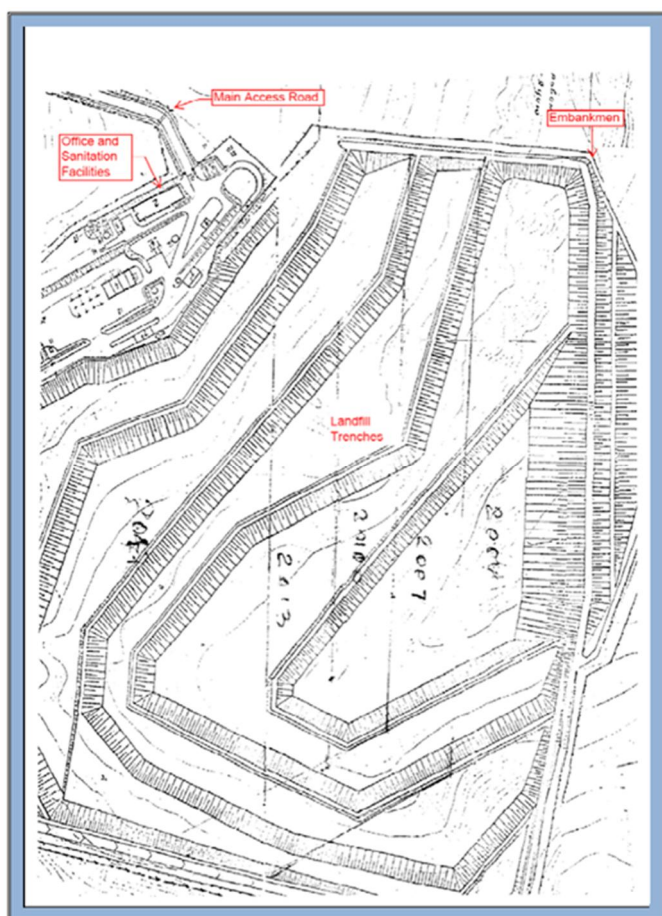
Layout Plan of the Landfill at Tintareni (WEG, 2012)
